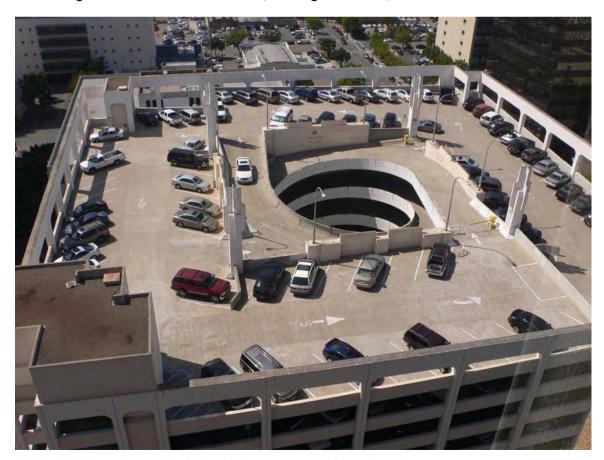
Evan Jones Parkade, looking west, rooftop elevation.
